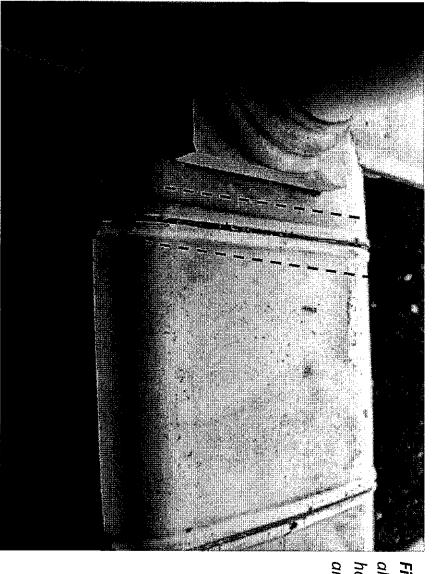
Figure F: Open joints between railing units allow water to seep into railings and walls, hastening the deterioration of terra cotta and masonry below.
